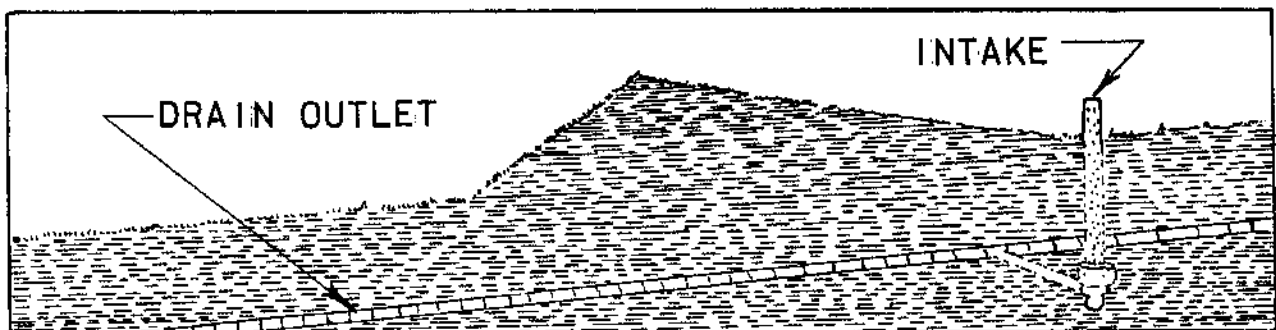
Cross-sectional view of Terraces using perforated pipe intake with underground outlet.
